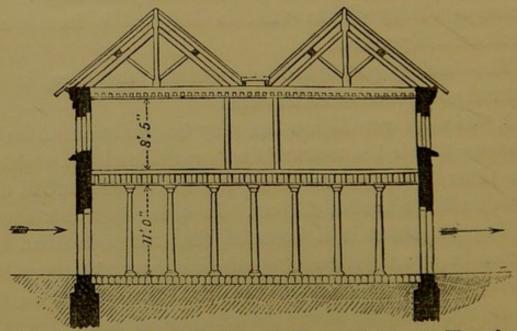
Transverse Section of Troop Stable at Hounslow Barracks. Eight horses are placed between opposite windows, with their heads to dividing walls. The arrows indicate the direction of the wind.
